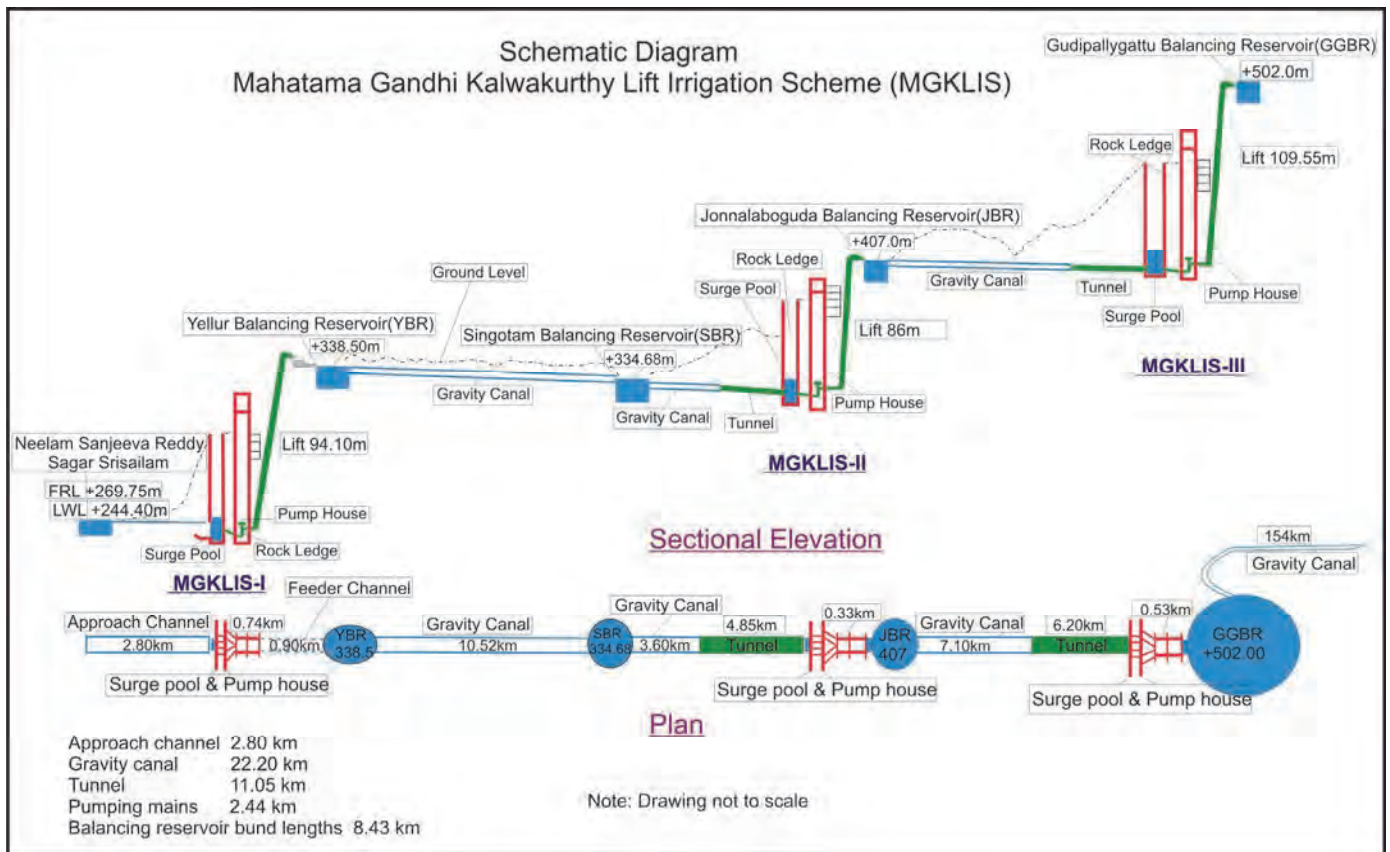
Plan and elevation of schematic drawing of MGKLIS [1]
